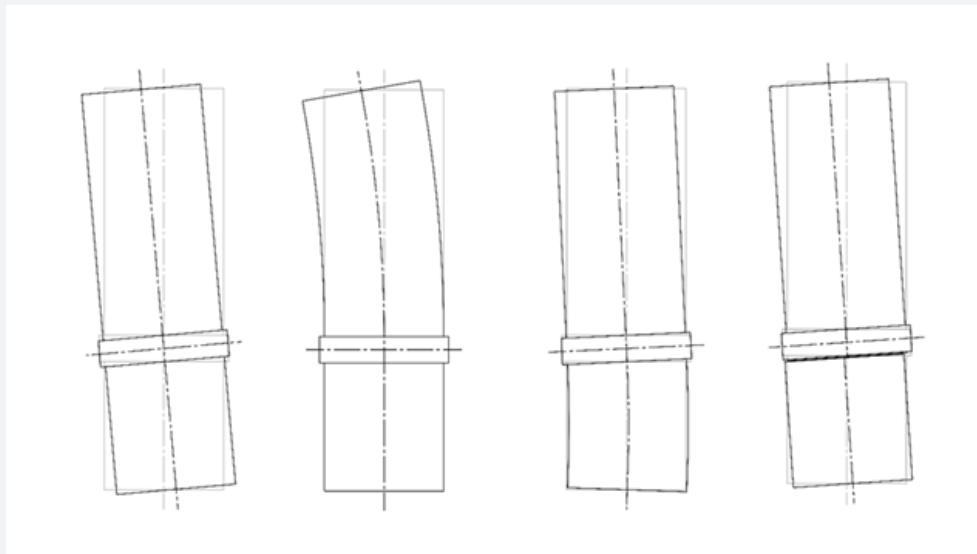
Deformation components: a) rigid body rotation b) bending in the cantilevered wall part c) bending in the clamping wall part d) sliding in the construction joint between the basement wall and the ceiling cutout.
